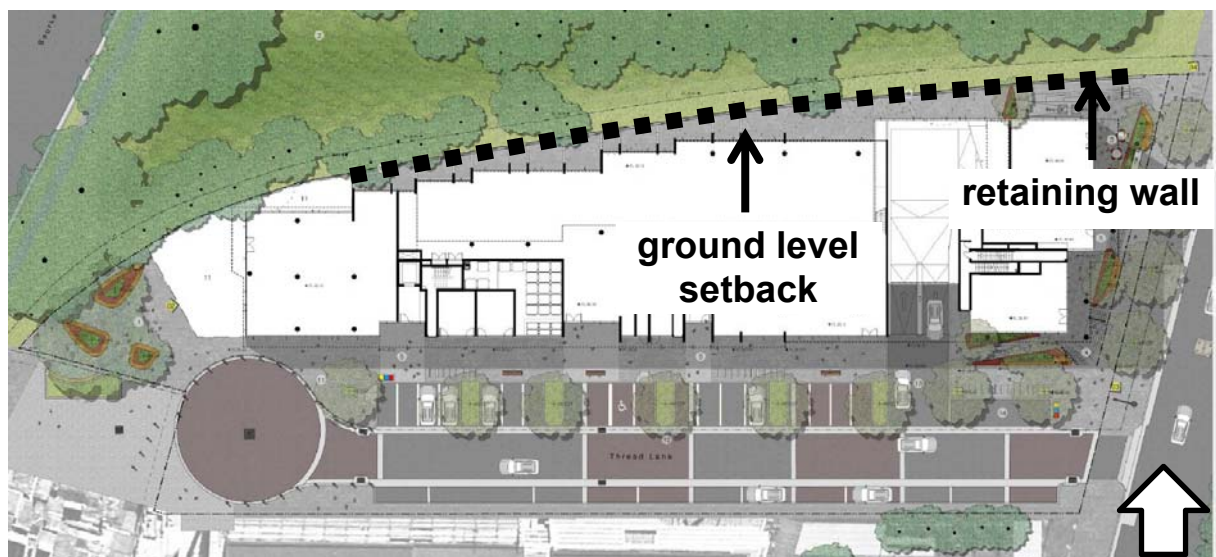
Diagram of the ground level landscape plan illustrating the location of the retaining wall and hardscape setback.
